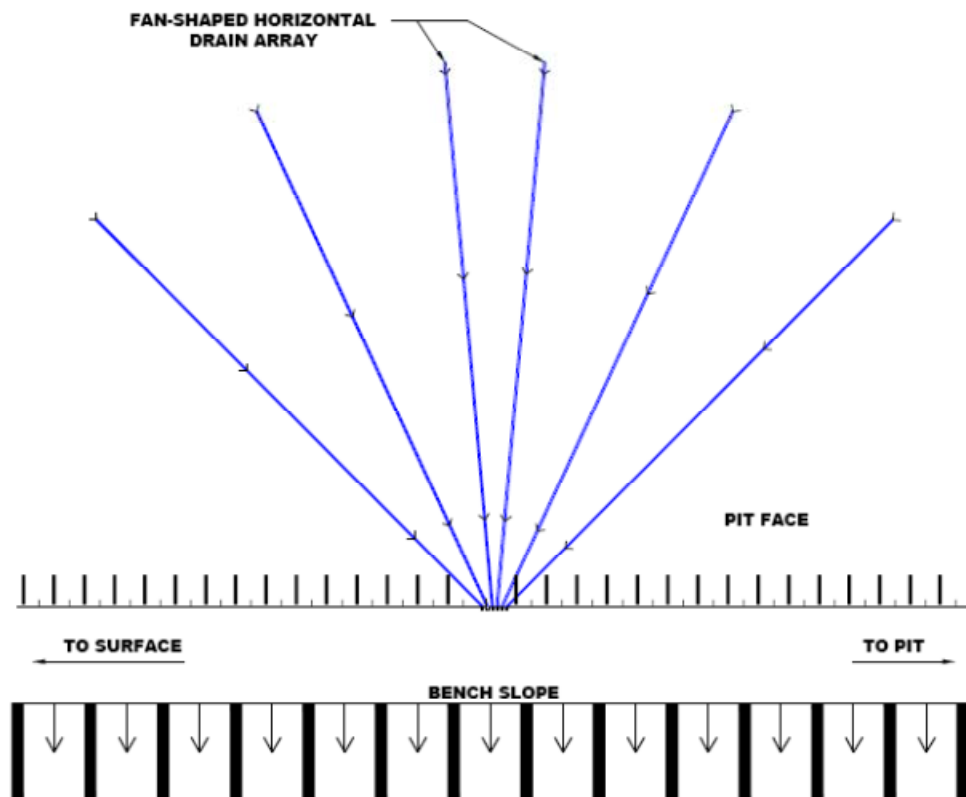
Plan view of fan-shaped horizontal drain array.
